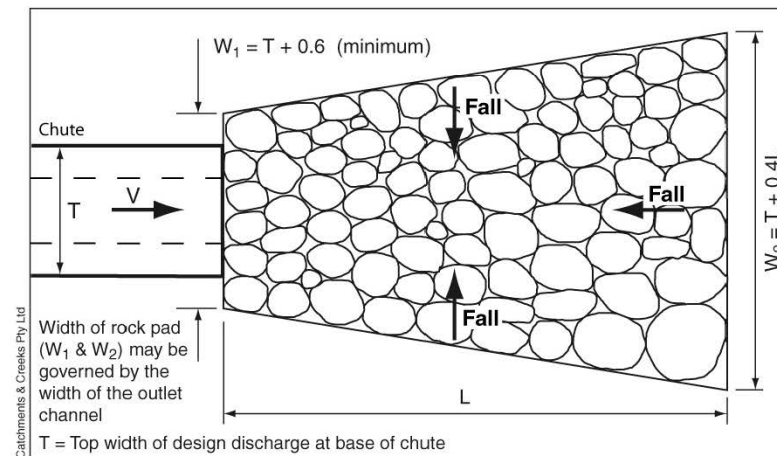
Typical layout of a recessed rock pad for a chute (plan view)
